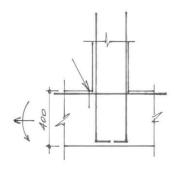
Floor section, 400 mm thick, eccentrically loaded
